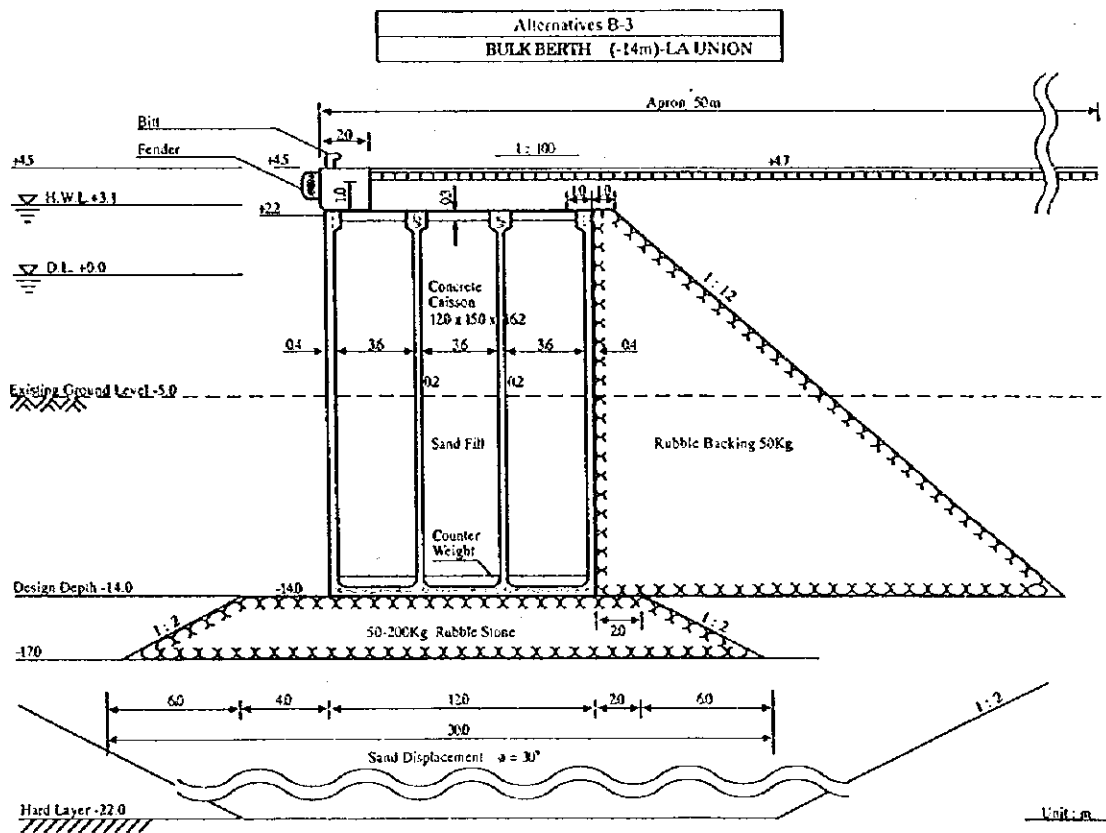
Concrete Caisson Type Bulk Berth (-14m)
